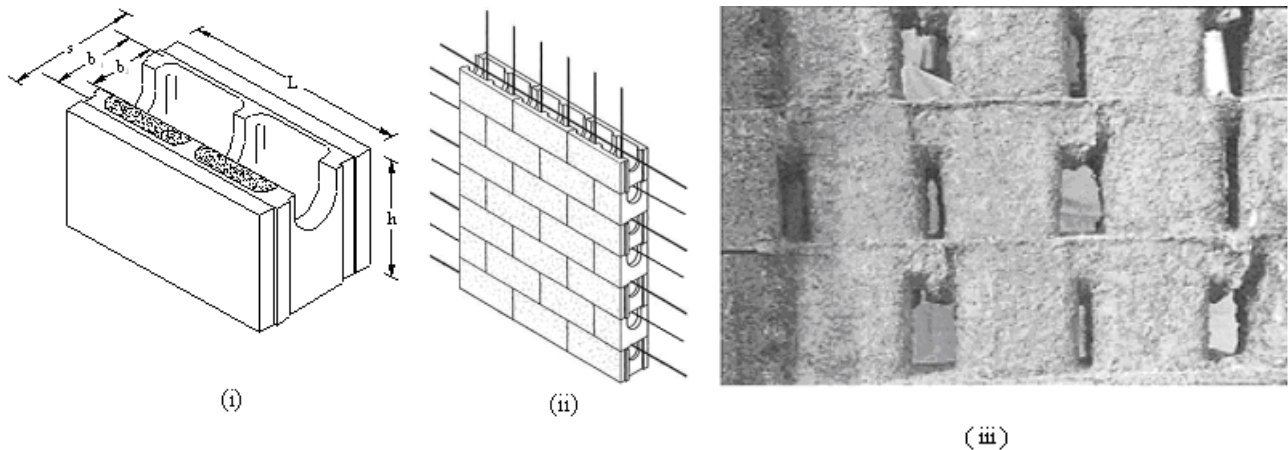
(i) picture and horizontal section of the typical formwork block, (ii) an ensemble of block assembled in order to create a structural wall and (iii) a picture of a 140mm thick wall without the external and internal shuttering (grid type structural pattern).
